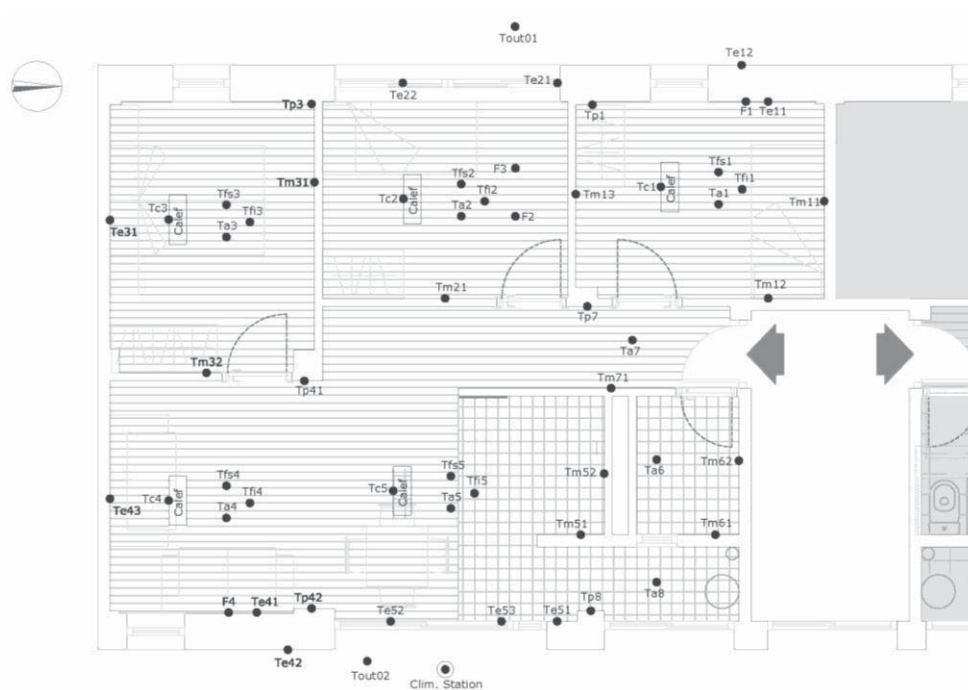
13. Layout of the studied dwelling after retrofitting works
